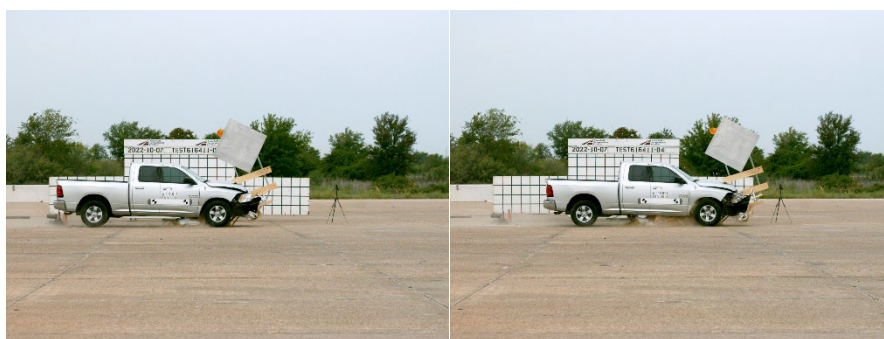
Sequential Photographs for Test No. 616411-01-4 (Oblique Views).
